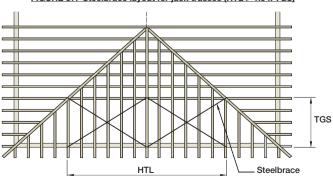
Steelbrace layout for iack trusses (HTL > 1.5 x TGS)
